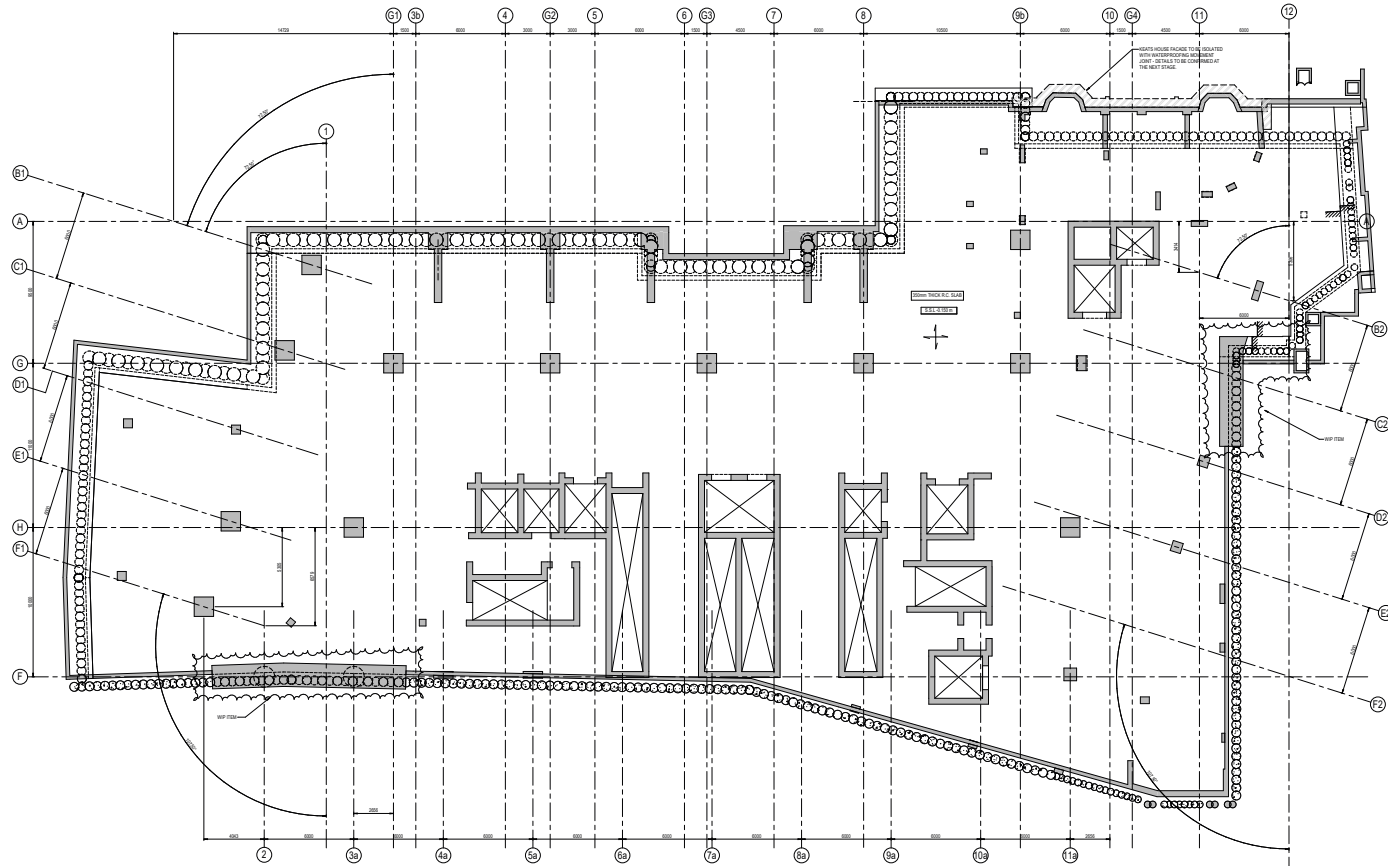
Structural drawing (indicative) of the proposed B1 Basement Level
